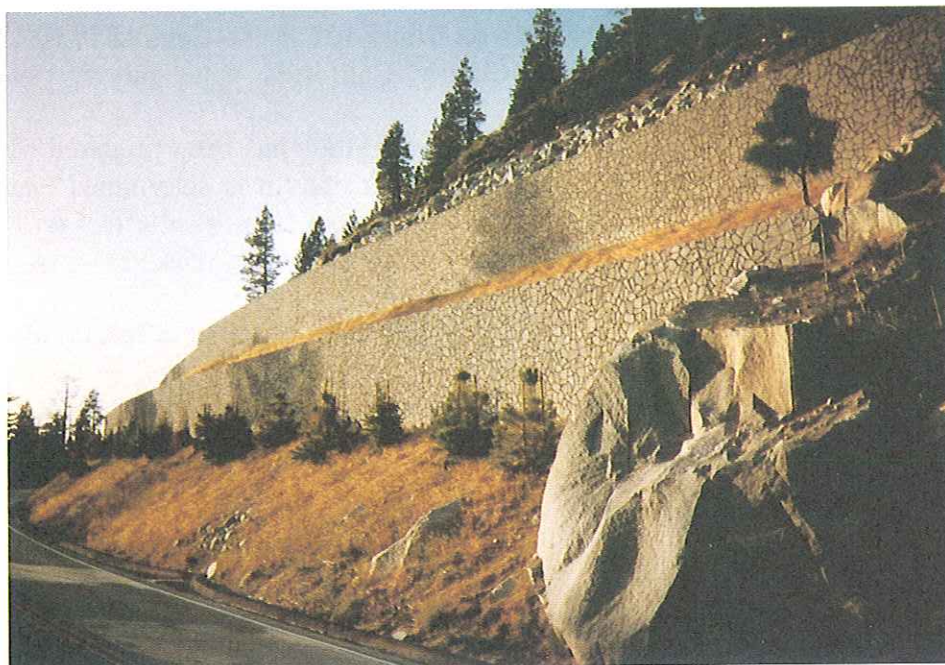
Figured facing on concrete retaining walls to improve the appearance. This is a relatively low-cost aesthetic improvement, achieved by the use of commercial form liners (*Courtesy Caltrans*).
